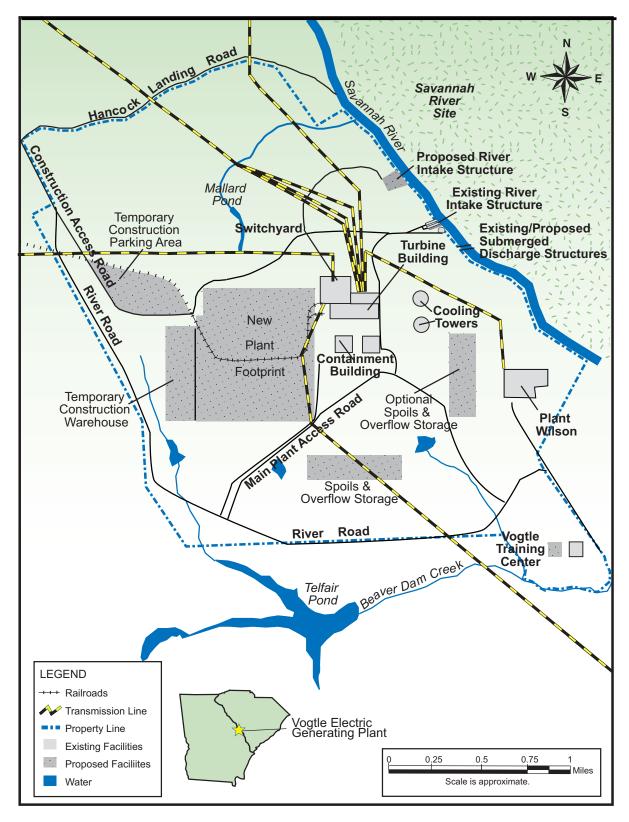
VEGP Site and Proposed New Plant Footprint
